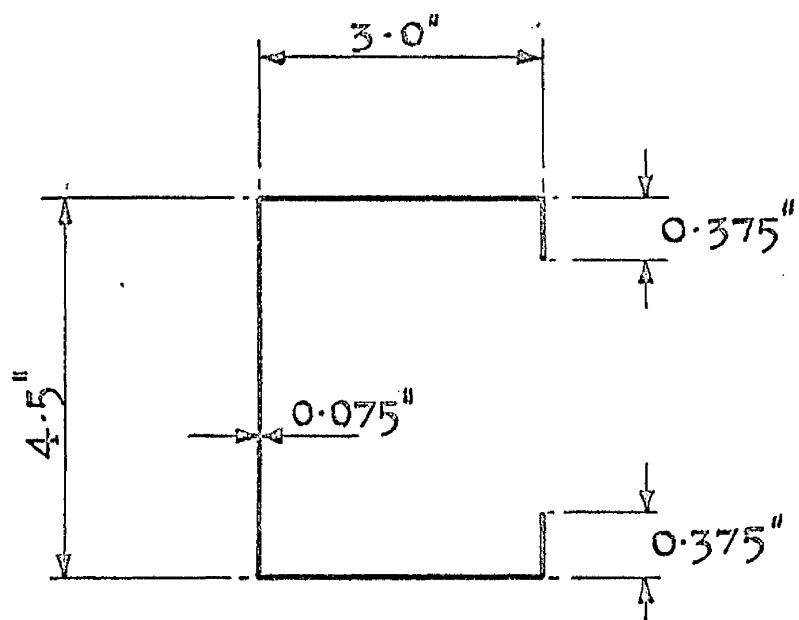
DIMENSIONS OF THIN-WALLED LIPPED CHANNEL SECTION TEST BEAM.
